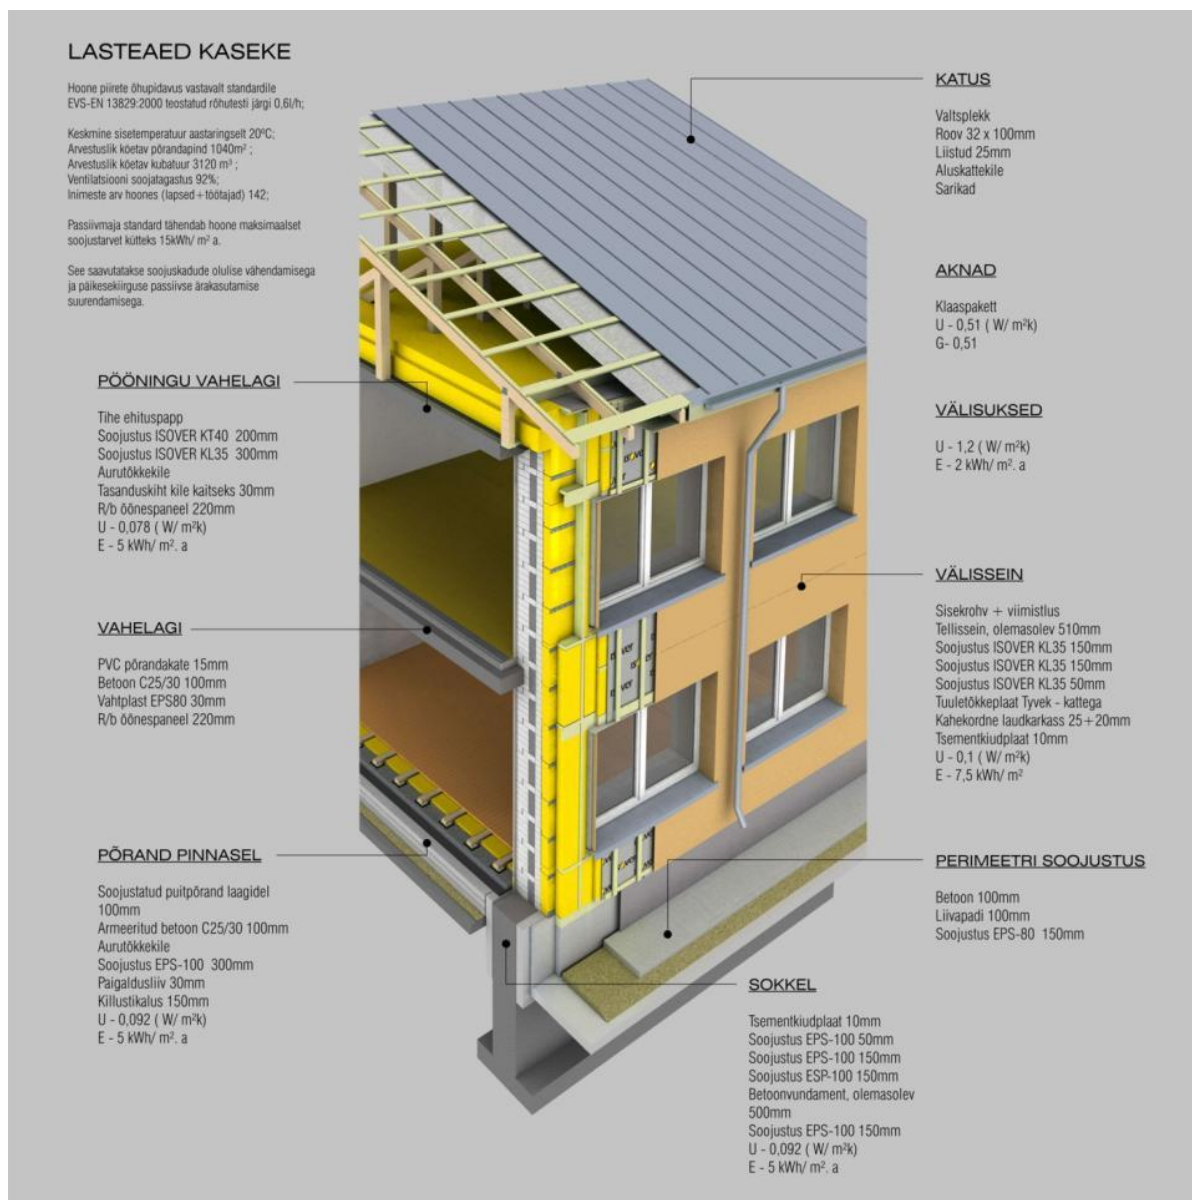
Basic refurbishment concept – well insulated, thermal-bridge free and airtight envelope.
